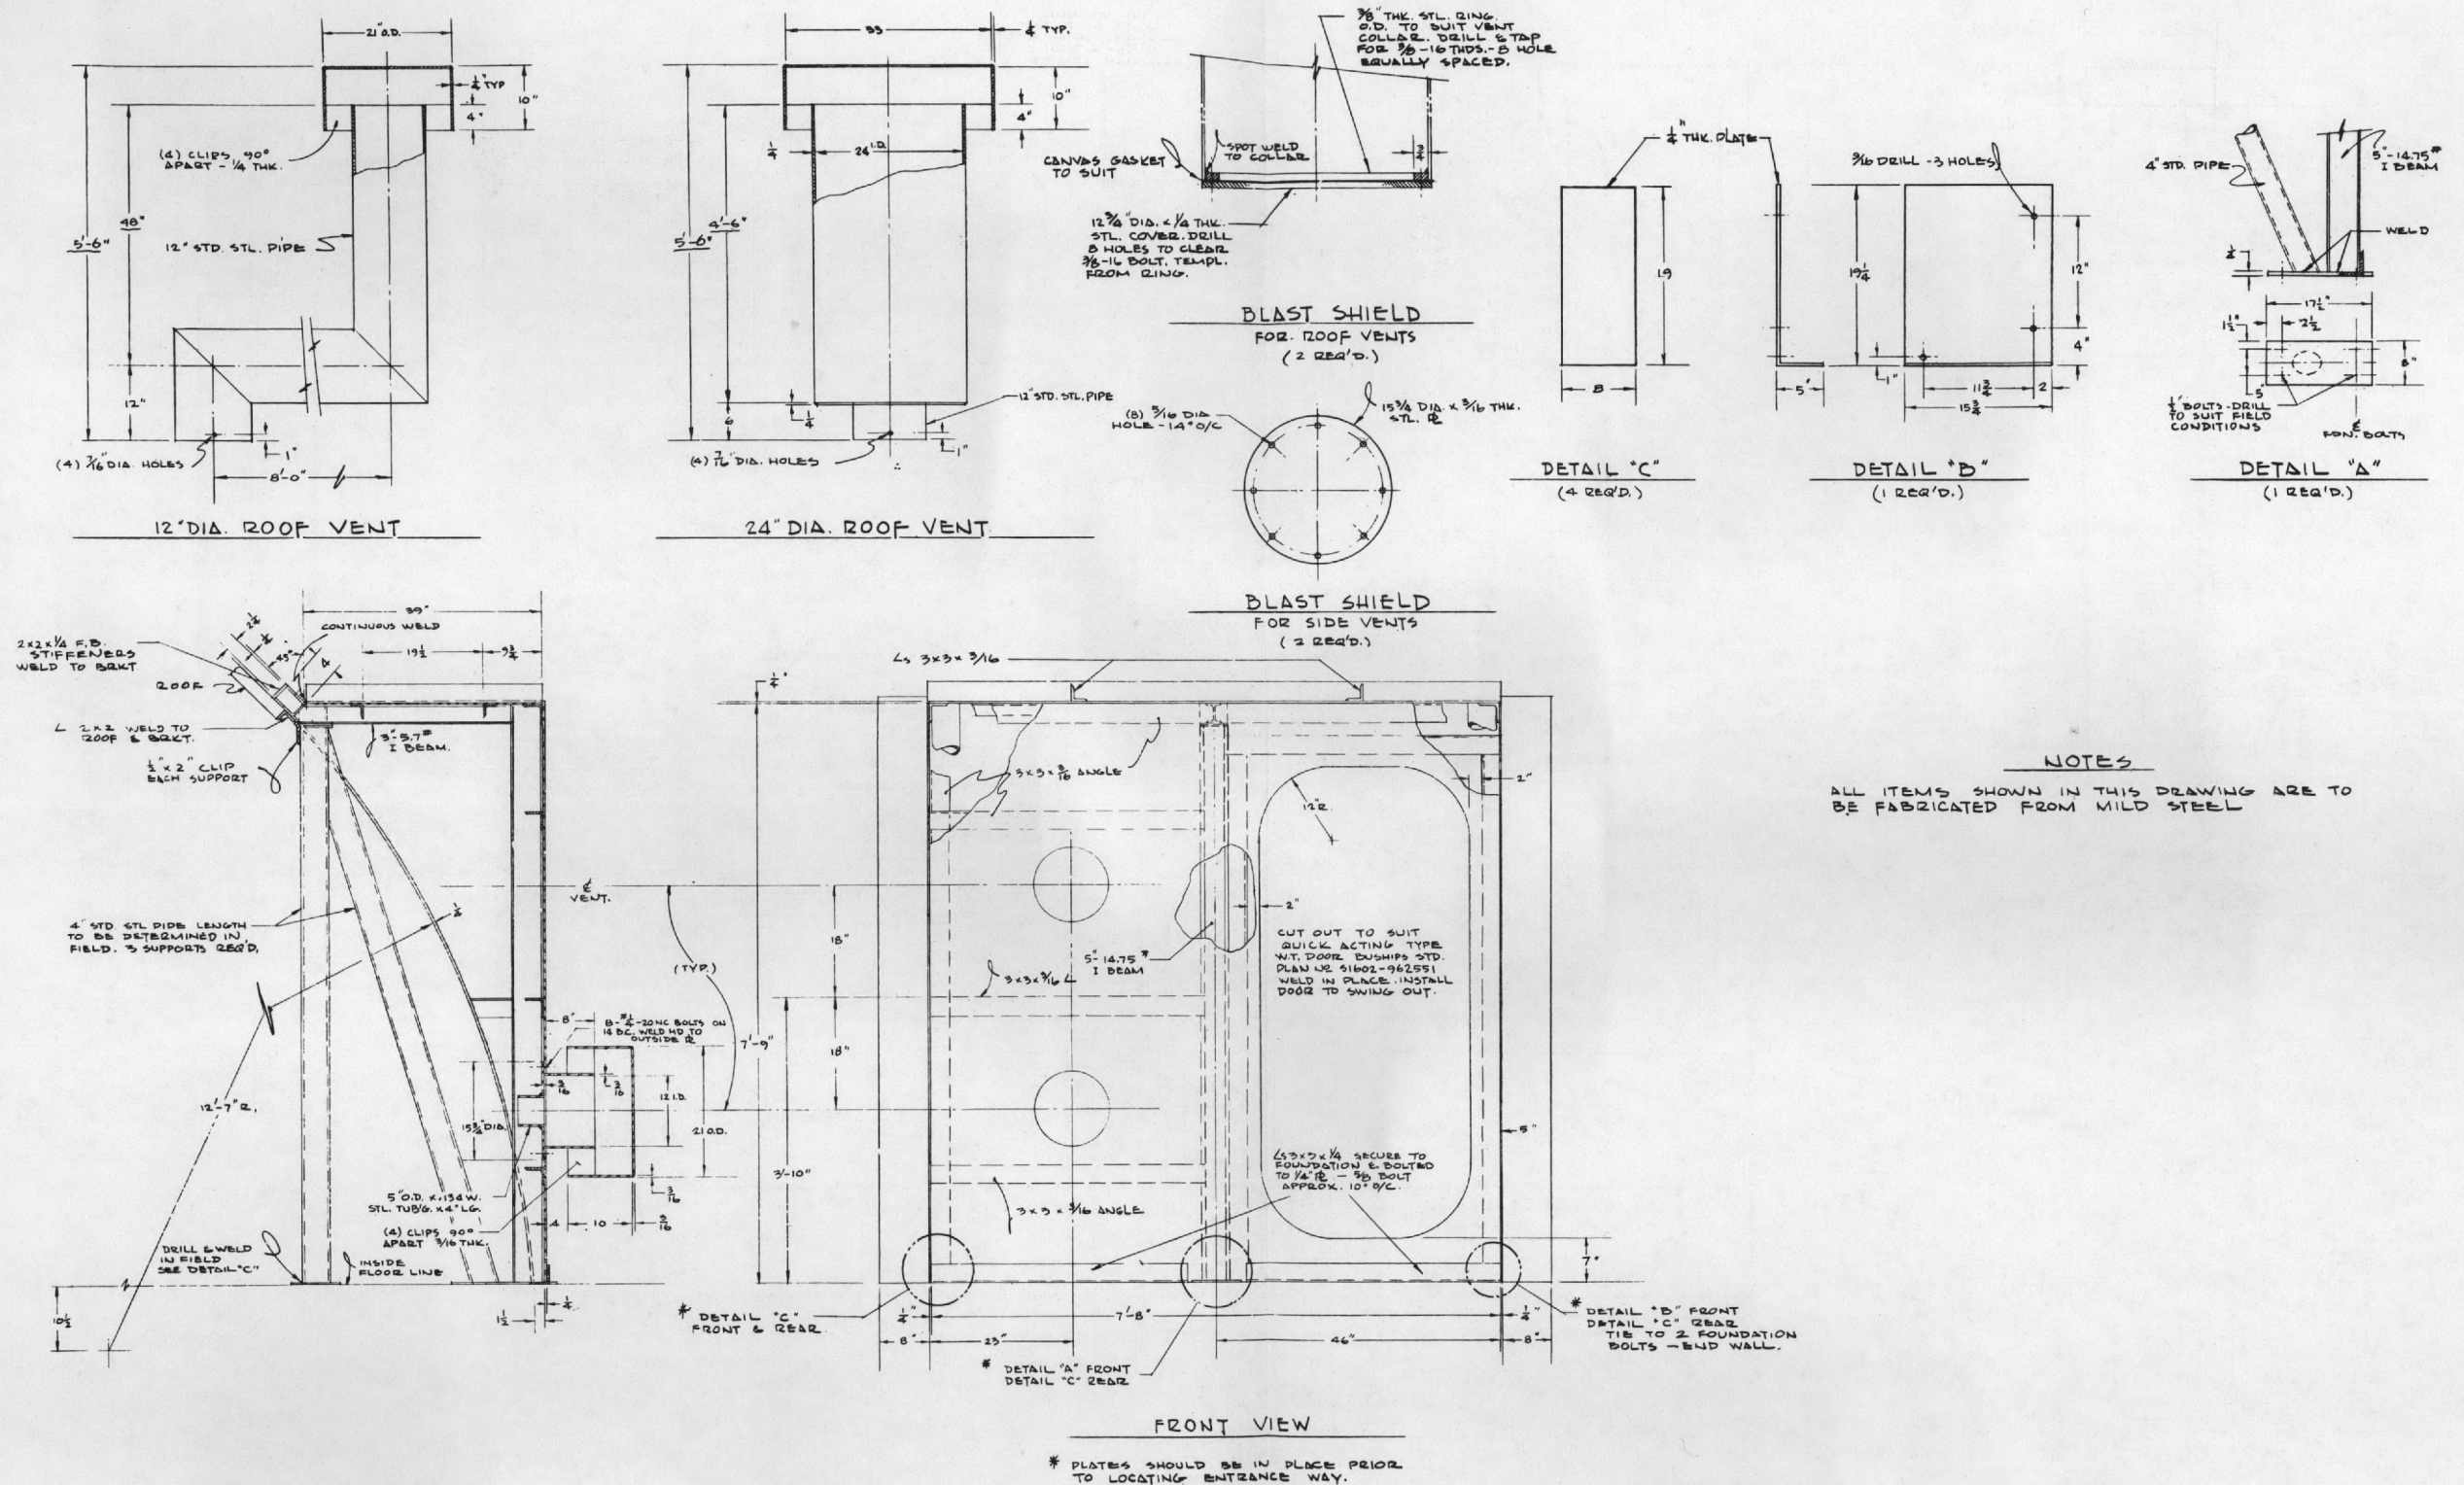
Underground Personnel Shelter - Entrance and Vent Details.
